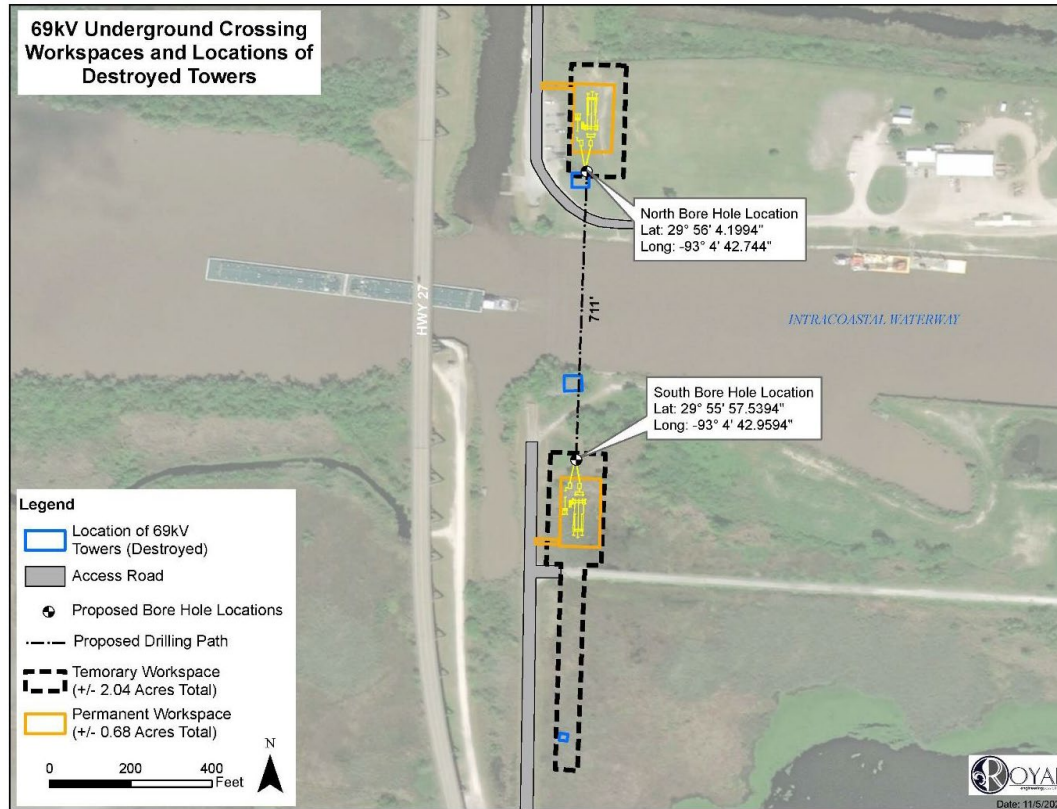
69kV Underground GIWW Crossing Preliminary Design
